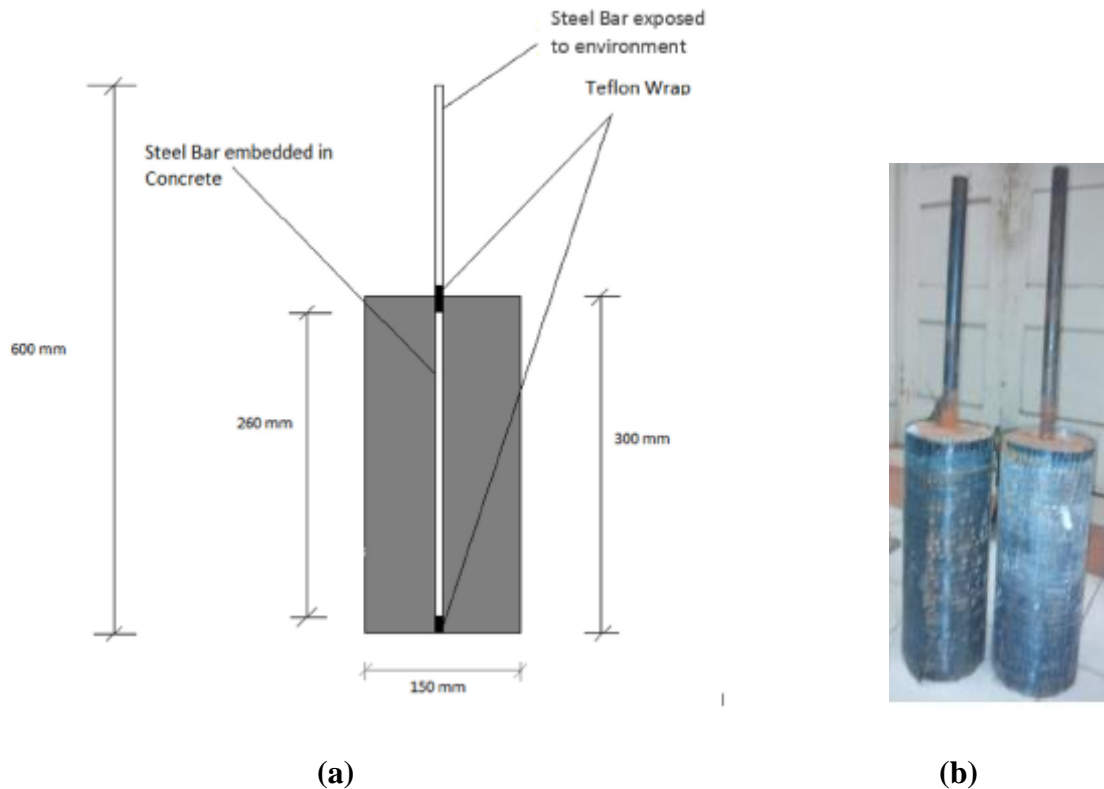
(a) Specimen schematic (b) Specimen wrapped with FRP[30]
